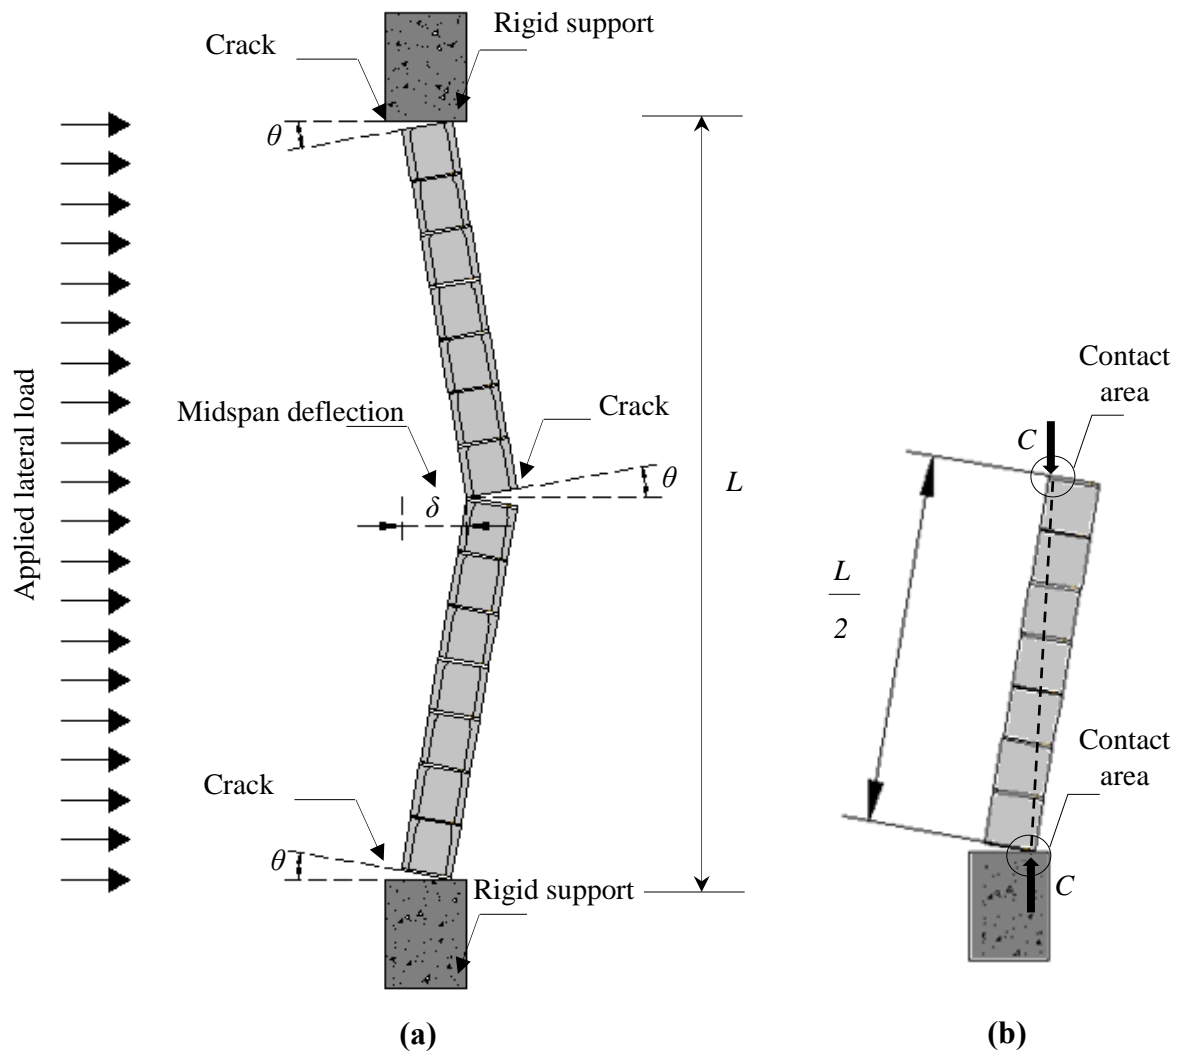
Arching mechanism in masonry walls: (a) deflected masonry wall, and (b) thrust force generated on the bottom masonry segment.
